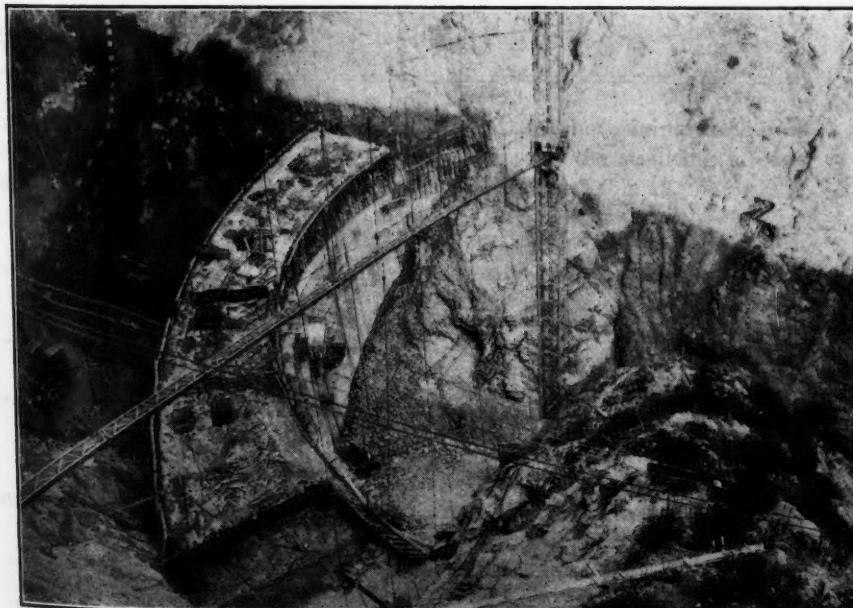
SANTA ANITA DAM, 150 FEET ABOVE BED-ROCK IN STREAM BED, MIXING PLANT TO THE LEFT NOT SHOWN. ROSS CONSTRUCTION COMPANY, LOS ANGELES, CALIF., IS THE CONTRACTOR.
